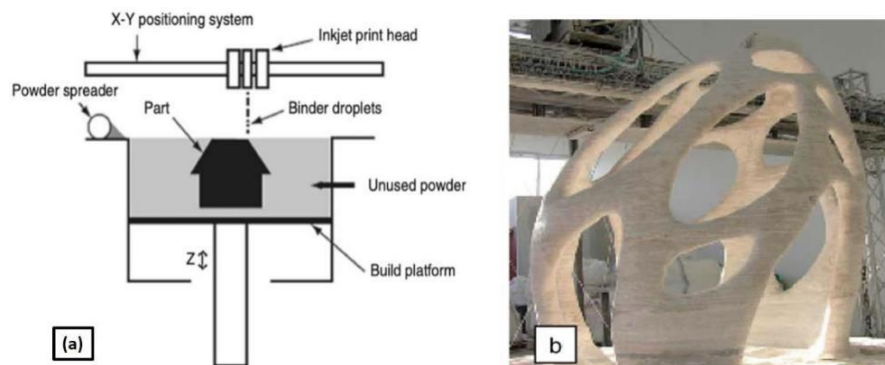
(a) Process of binder jetting (b) Egg shape structure using of binder jetting technique [34].
